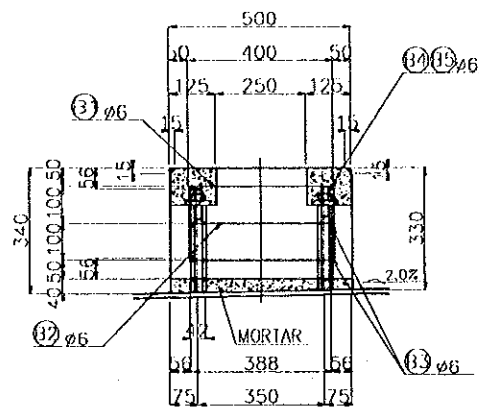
# DETAIL OF PRECAST CURB (FOR STEEL GIRDER)
